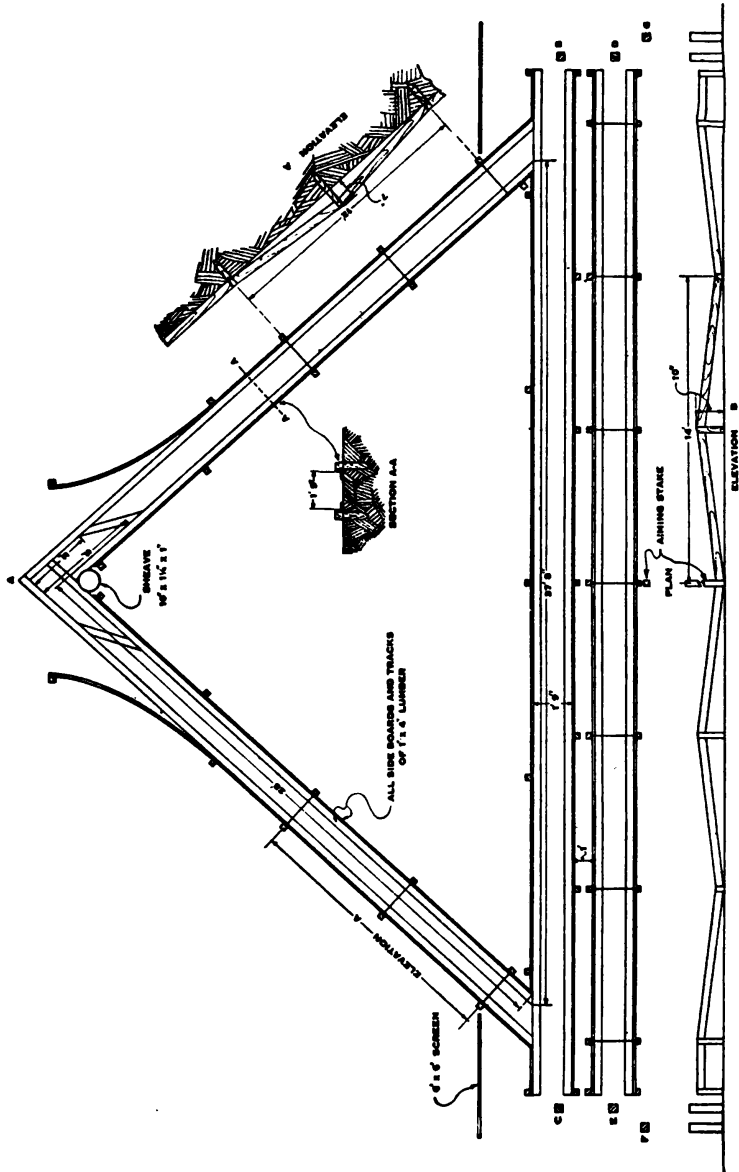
Dimensions and plan of construction, 1,000-inch range.
